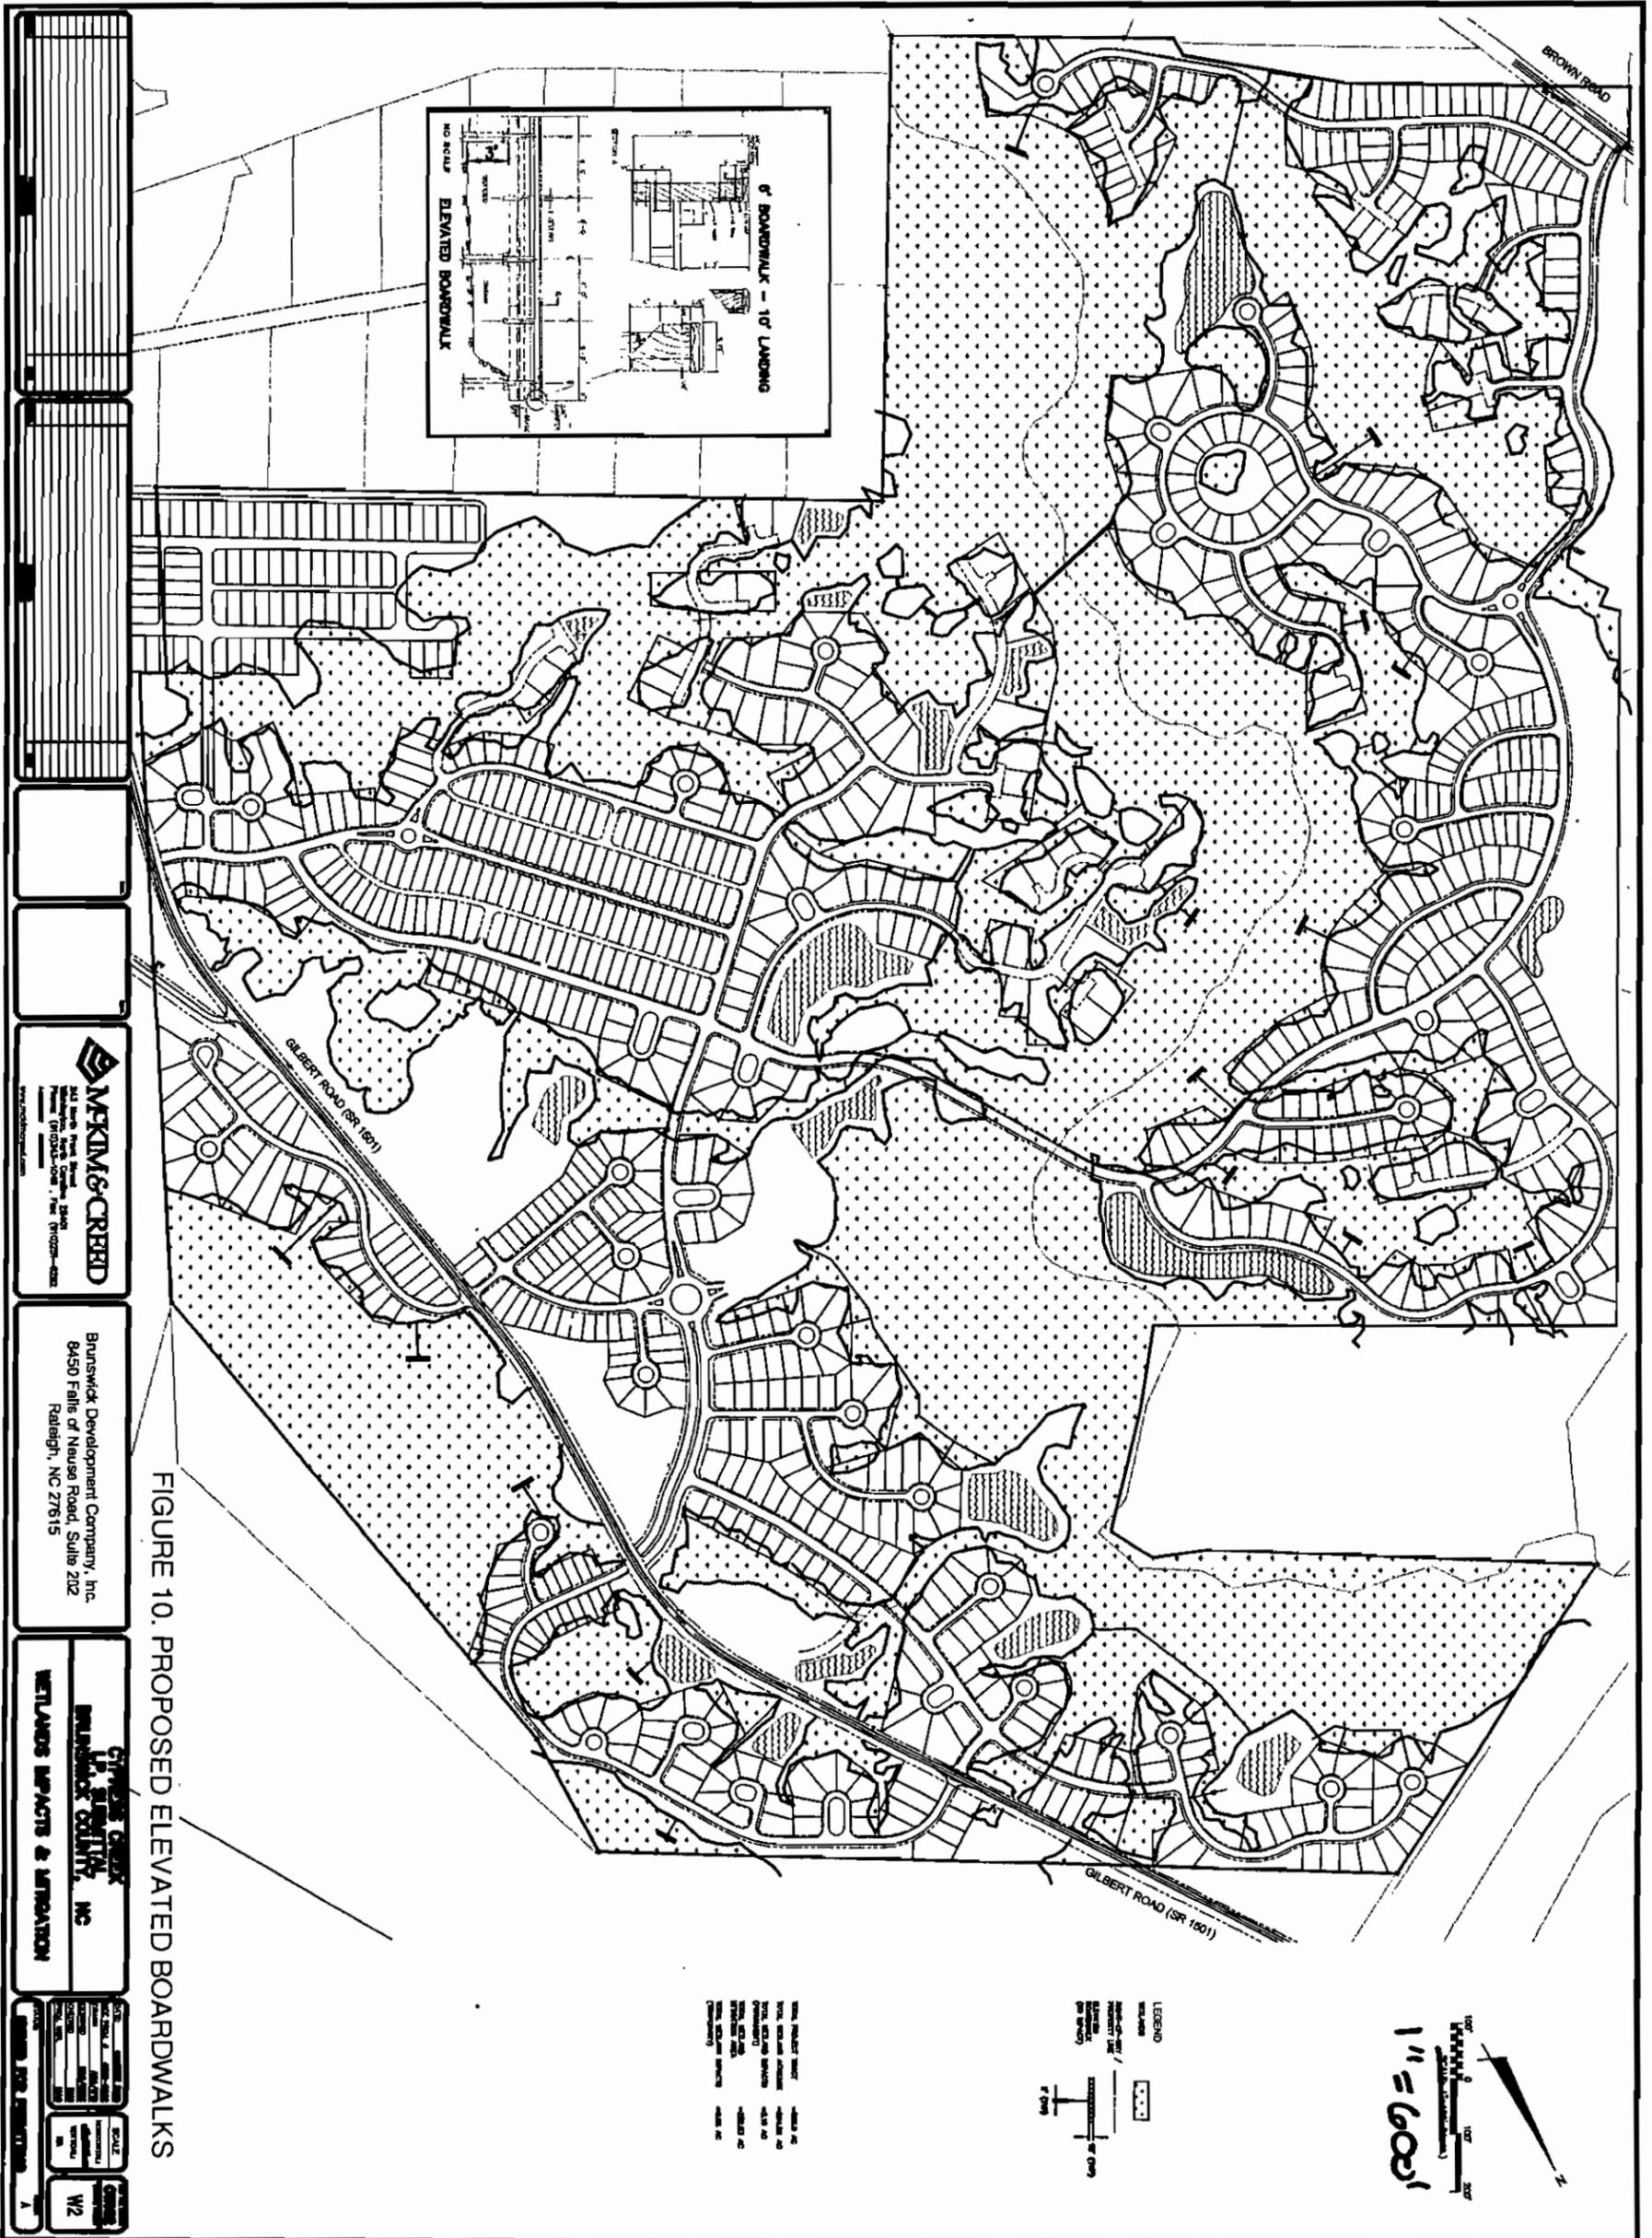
PROPOSED ELEVATED BOARDWALKS
